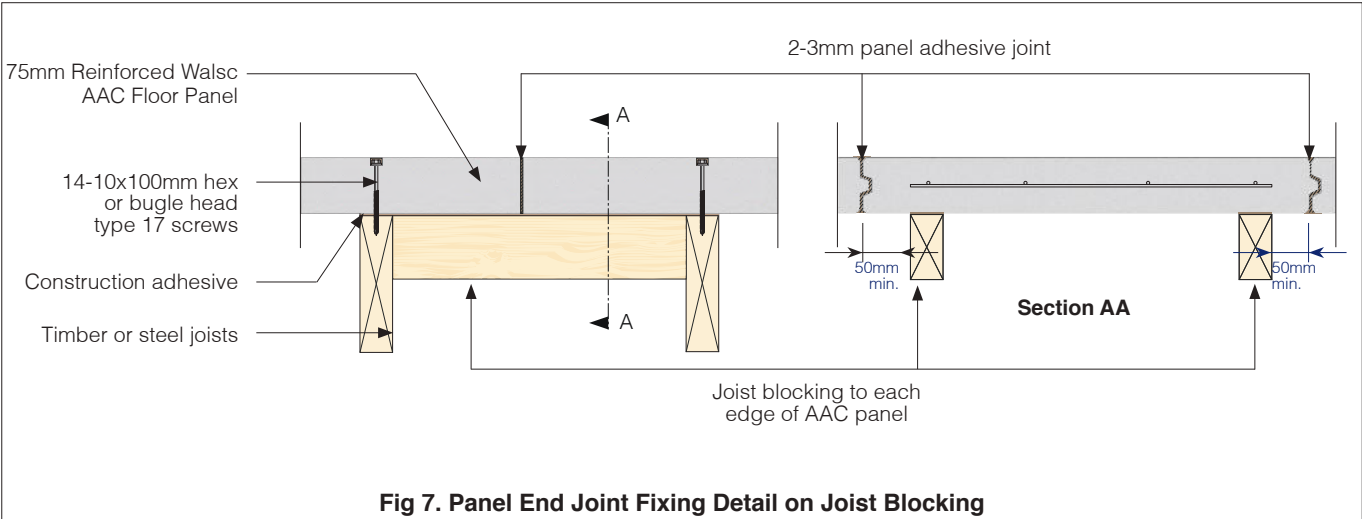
Panel End Joint Fixing Detail on Joist Blocking
